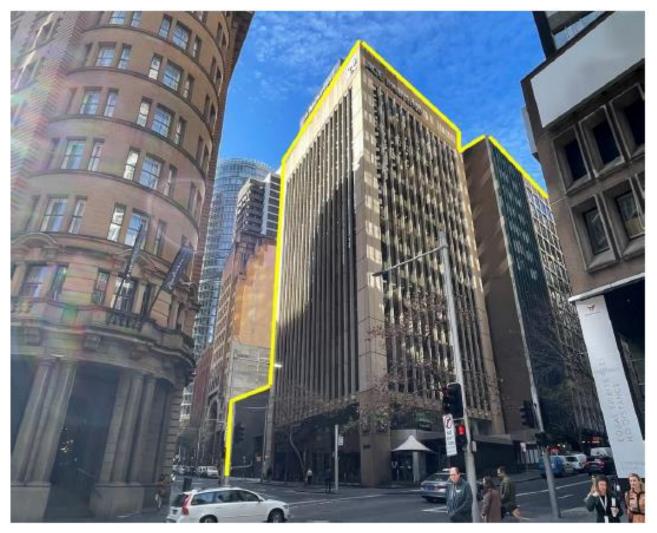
Photo of Existing Development at Eastern Site (Source: Planning Proposal)
